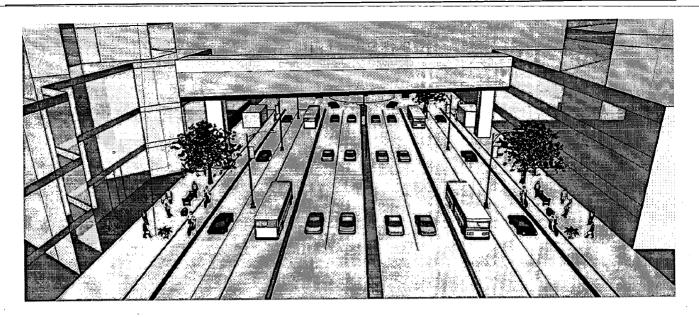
View of street as suggested in Alternative 2 with 45 m width
